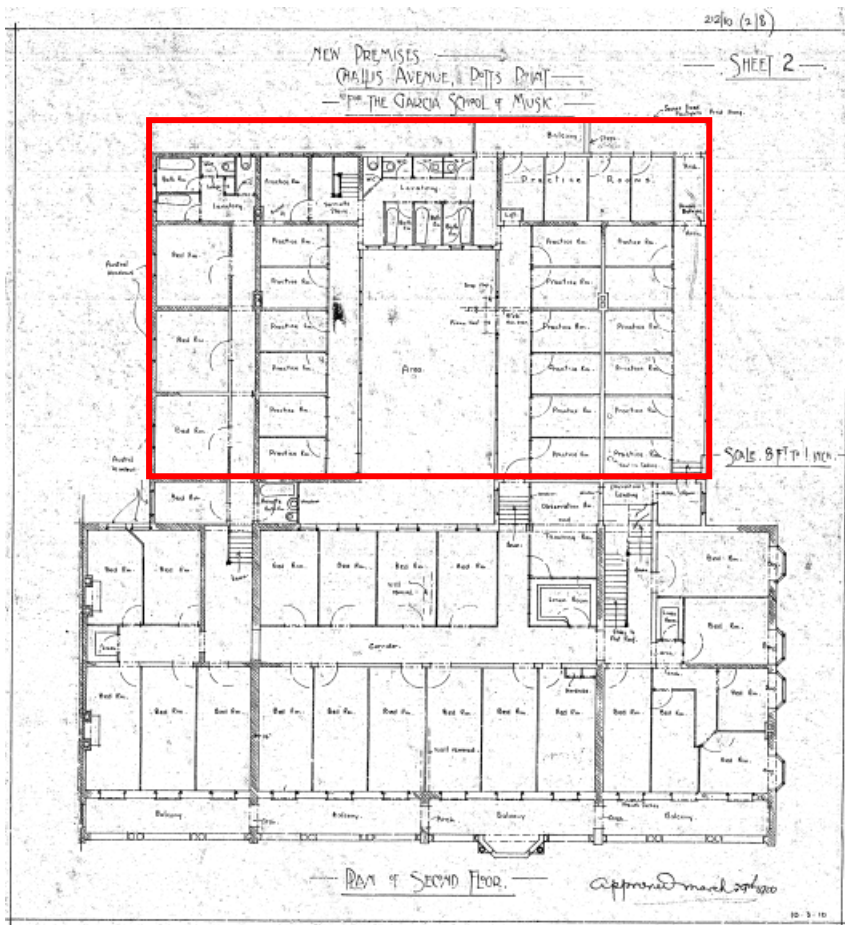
Original Architectural Drawing – Second floor Plan - Garcia School of Music (Source: City of Sydney Archives). The rear wings were demolished in 1998 (outlined by red rectangle)
